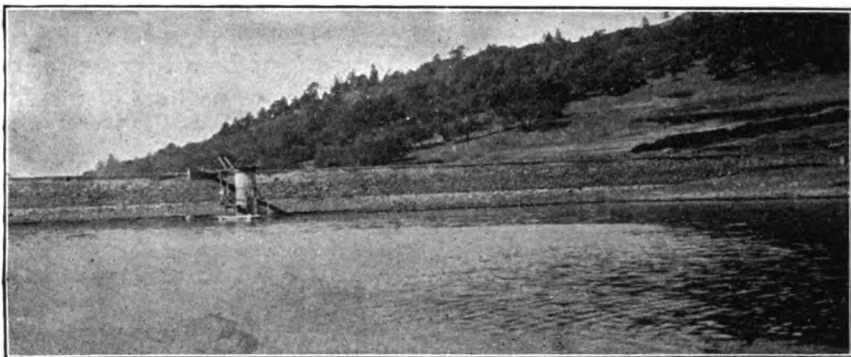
VIEW OF CUYAMACA DAM AND OUTLET-TOWER.
